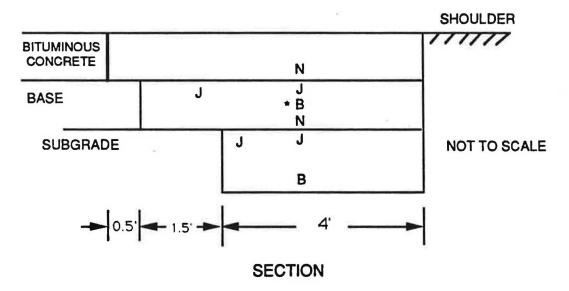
Sampling Point Locations Before Test Section, GPS-9 Unbonded Jointed Plain Concrete Pavement Overlay Over Concrete Pavement
